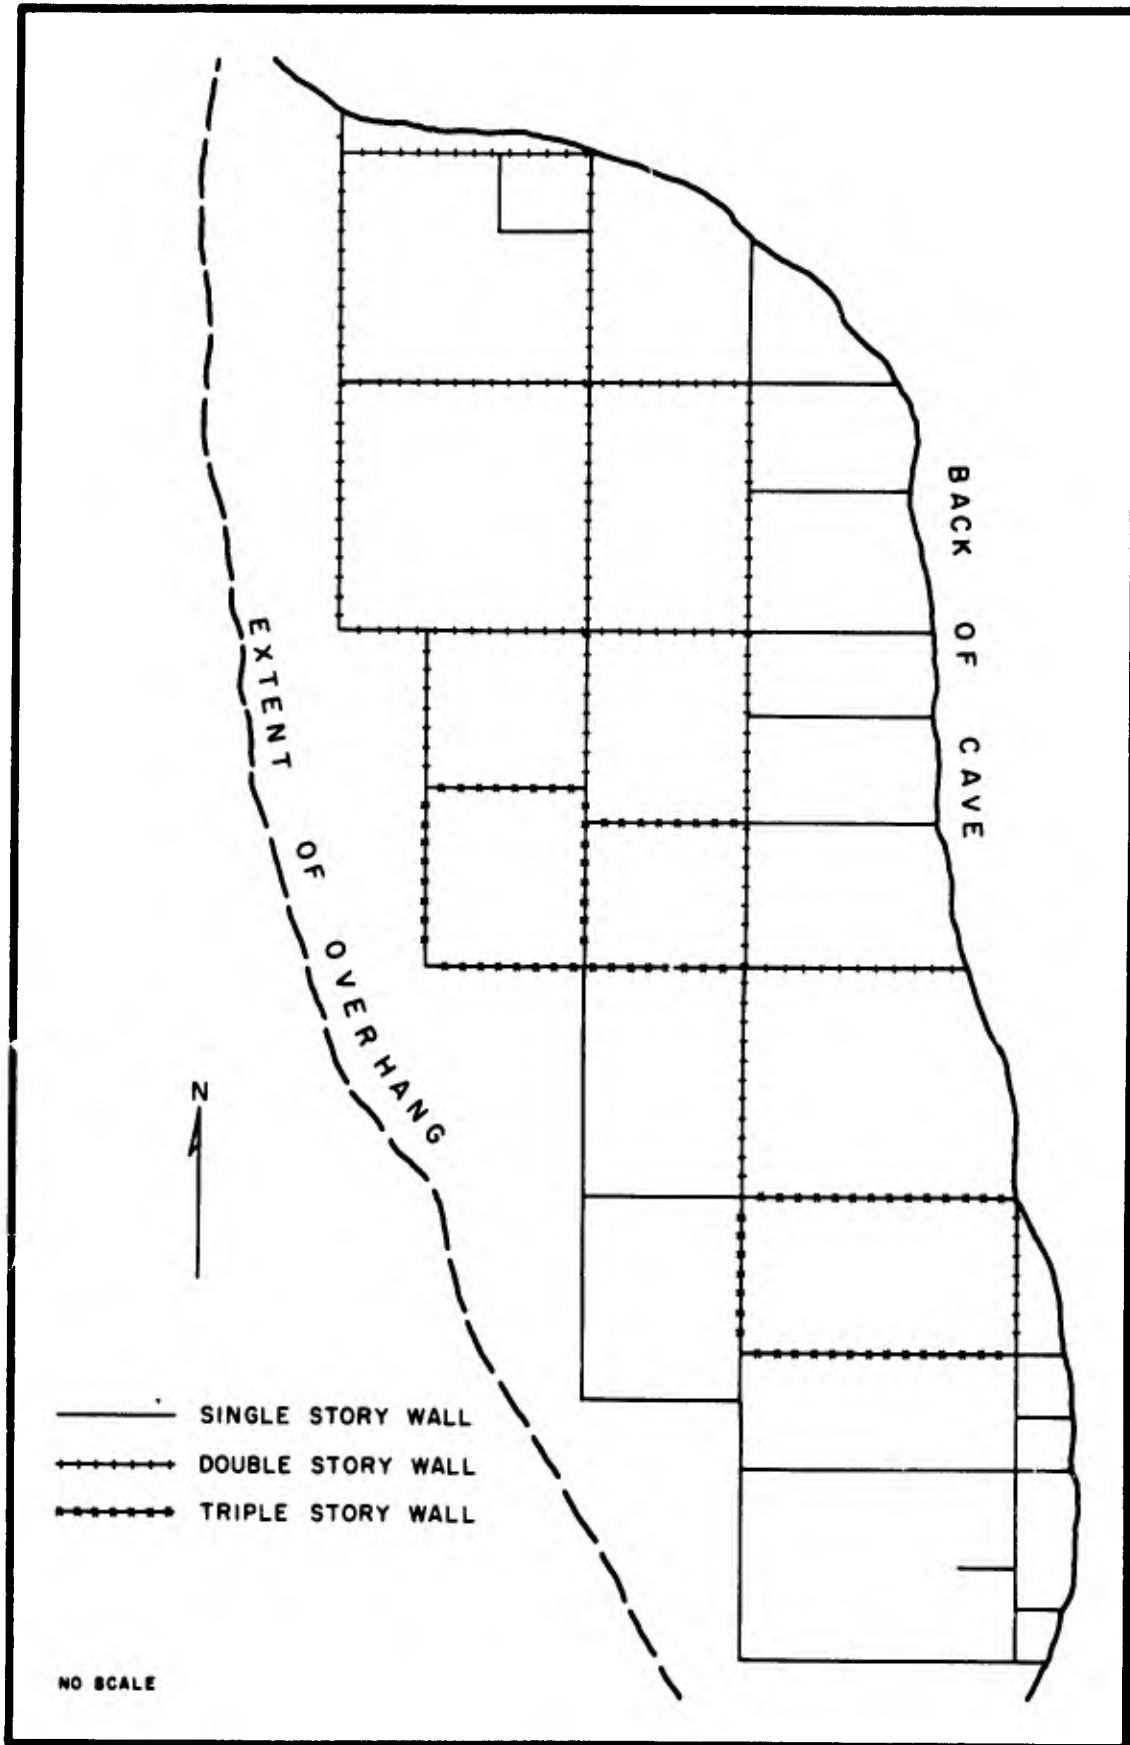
Floor Plan of Cave Ruin, Rio Gavilan
